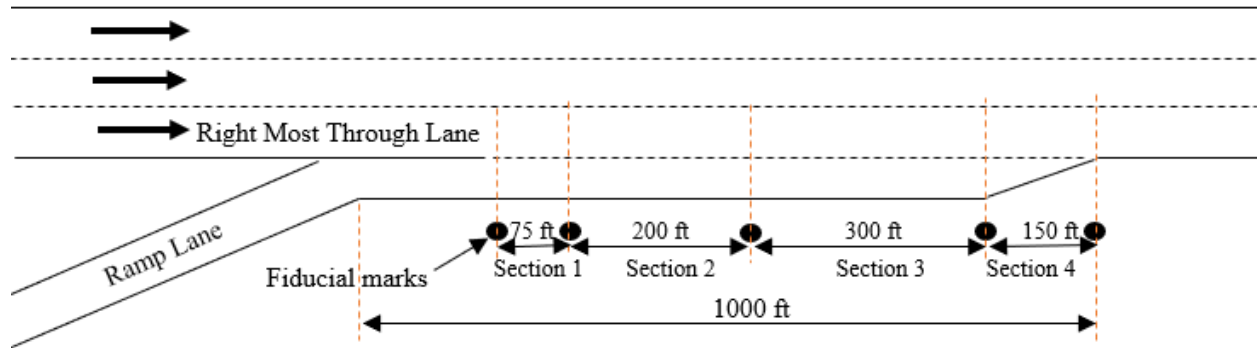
On-Ramp Geometry -I-75 at Corkscrew Road (Not to Scale)
